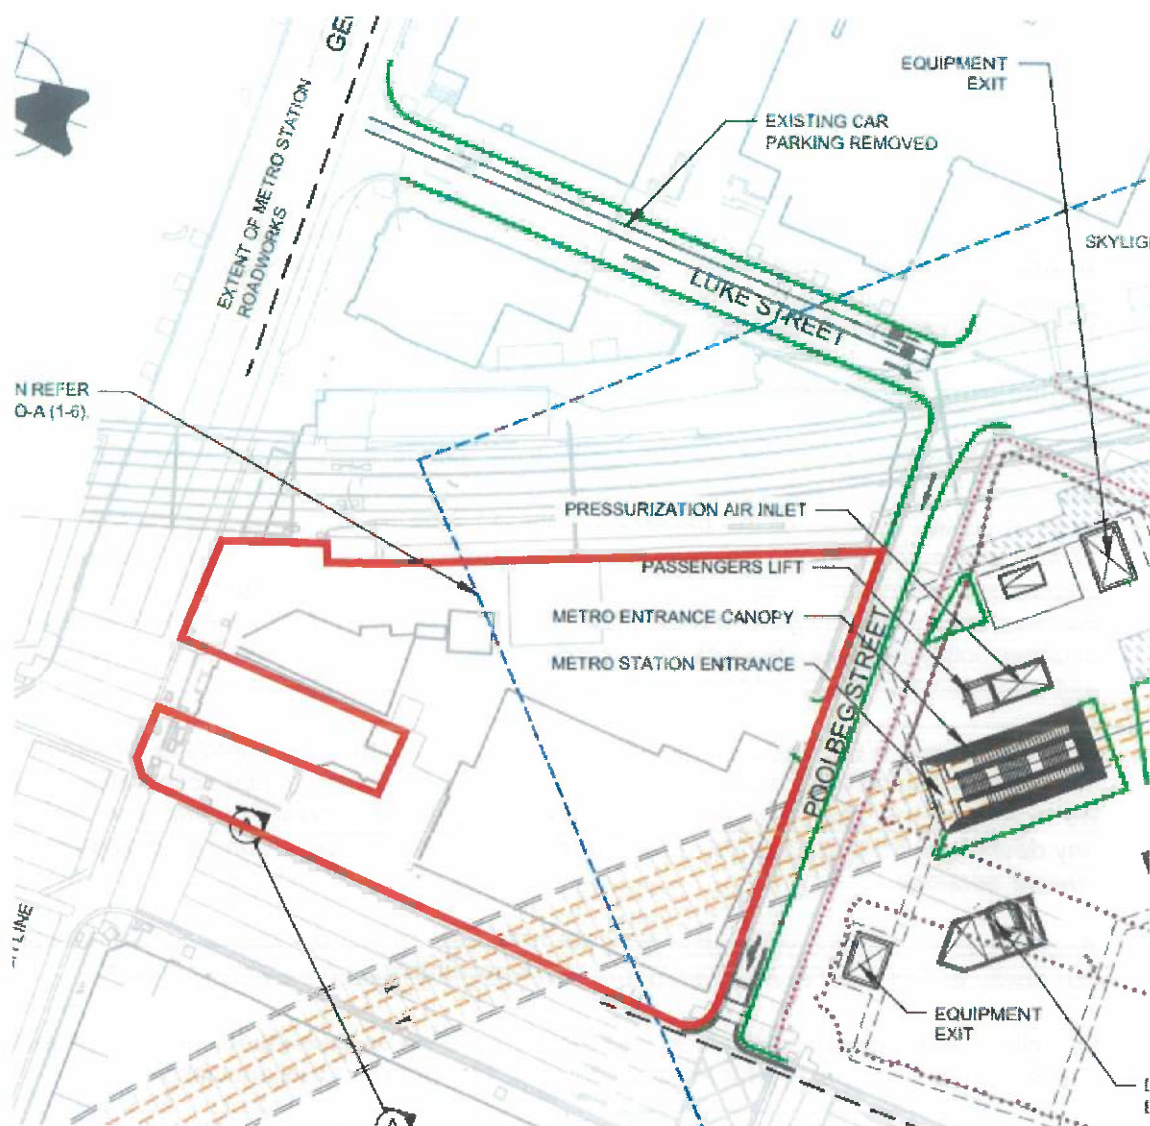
Proximity of the MetroLink line to the subject site (Source: metrolink.ie)
